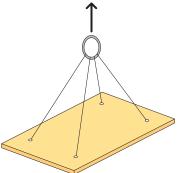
Example of a statically determinate system for handling floor and wall units.
